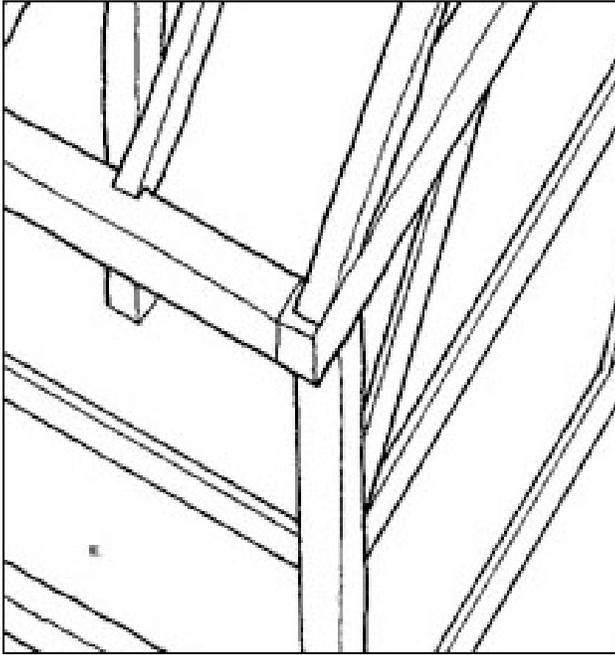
John Nelson Barn, detail of HABS isometric drawing showing overhanging girt and south plate.
